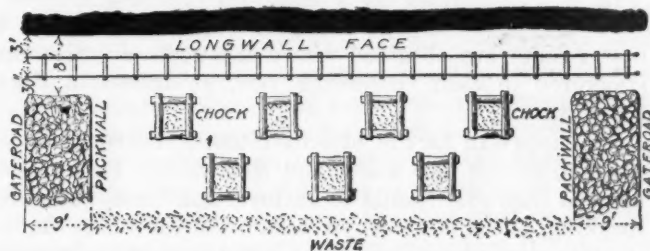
USE OF CRIBS OR CHOCKS ON A LONGWALL FACE
